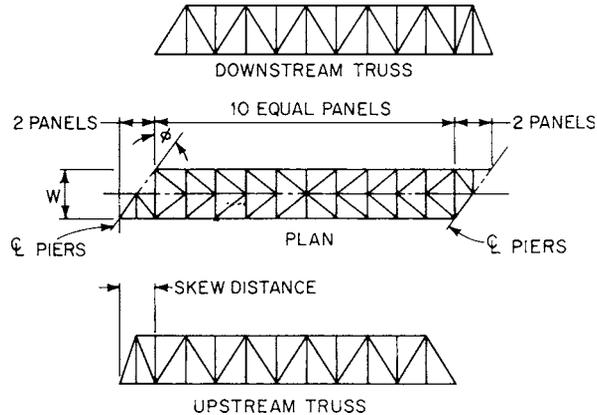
Skewed bridge with skew distance exceeding panel length.
